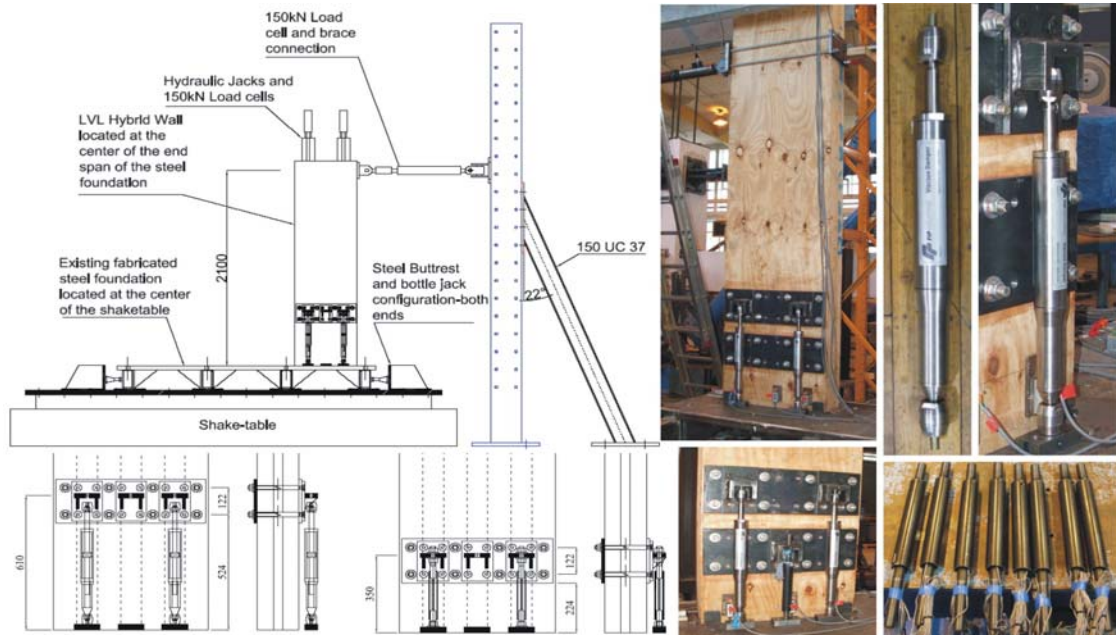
Dynamic wall testing images, Left: Experimental test set-up showing both viscous and mild steel damper arrangement; Right: Actual test rig and location of dissipation devices.
